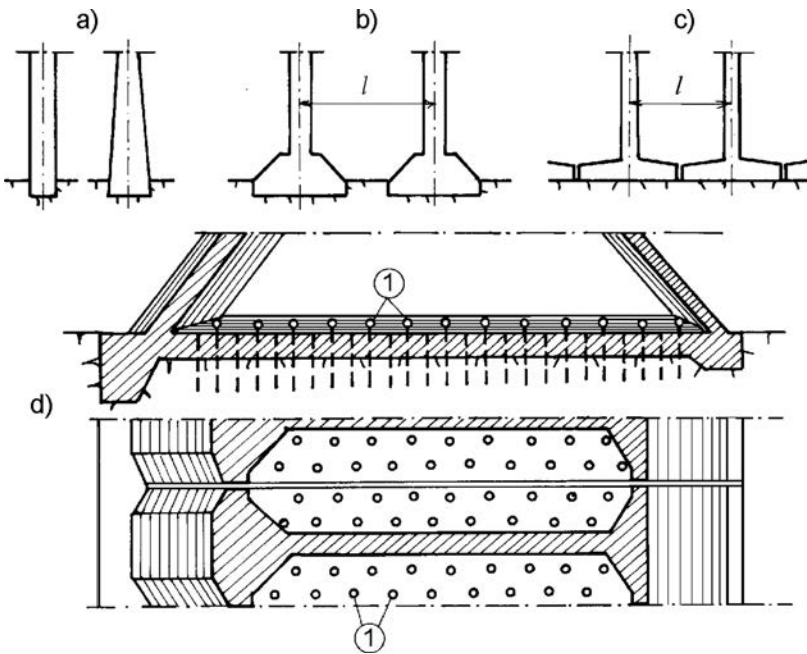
Founding of buttresses. (a) On sound, hard and firm rock; (b) on weaker rock; (c) with merged foundation footings; (d) detail of foundation with drainage openings (1).
